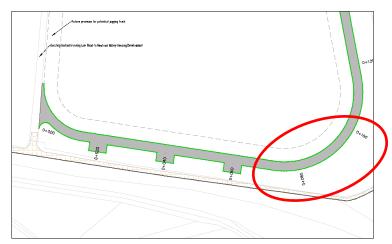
Pedestrian Desire Line with existing stone wall (Dwg No. 11587-2420-D02)
